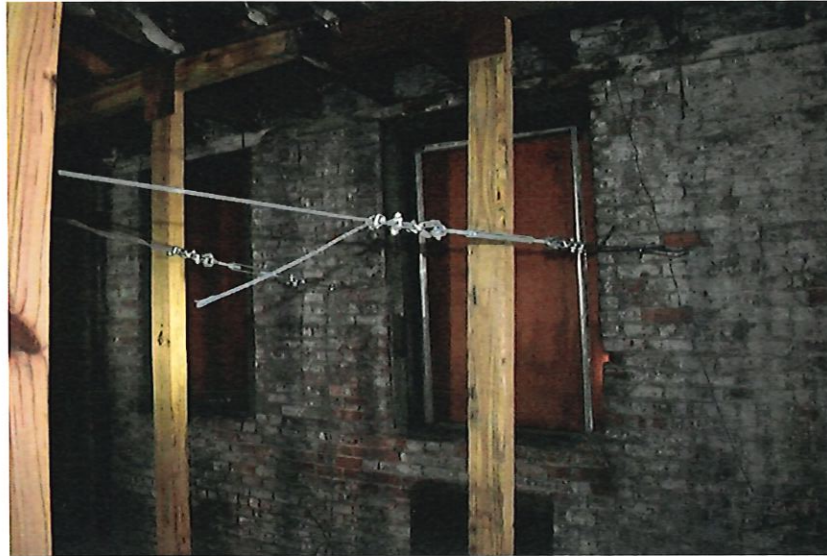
Area of collapsed brick wall and shoring of roof joists
